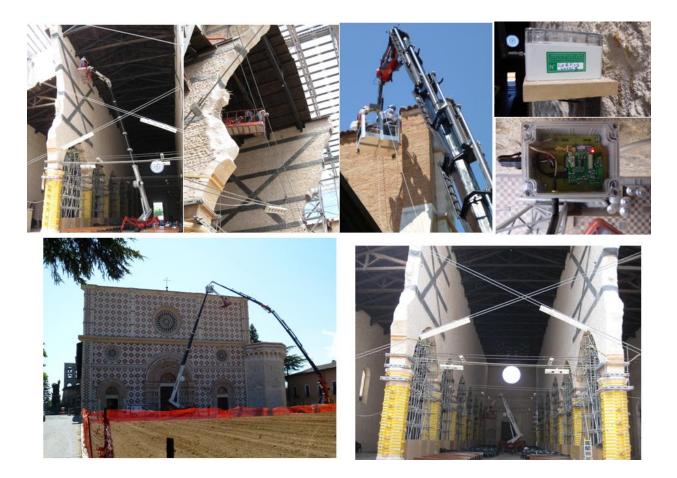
Installation phases of the monitoring system at the Basilica di S. Maria di Collemaggio: a) b) sensor positioning on the central walls of the nave, c) sensor positioning beyond the facade, d) f) sensor views, g) phase of on-site testing, h) sensor positioning at the end of the nave walls.
